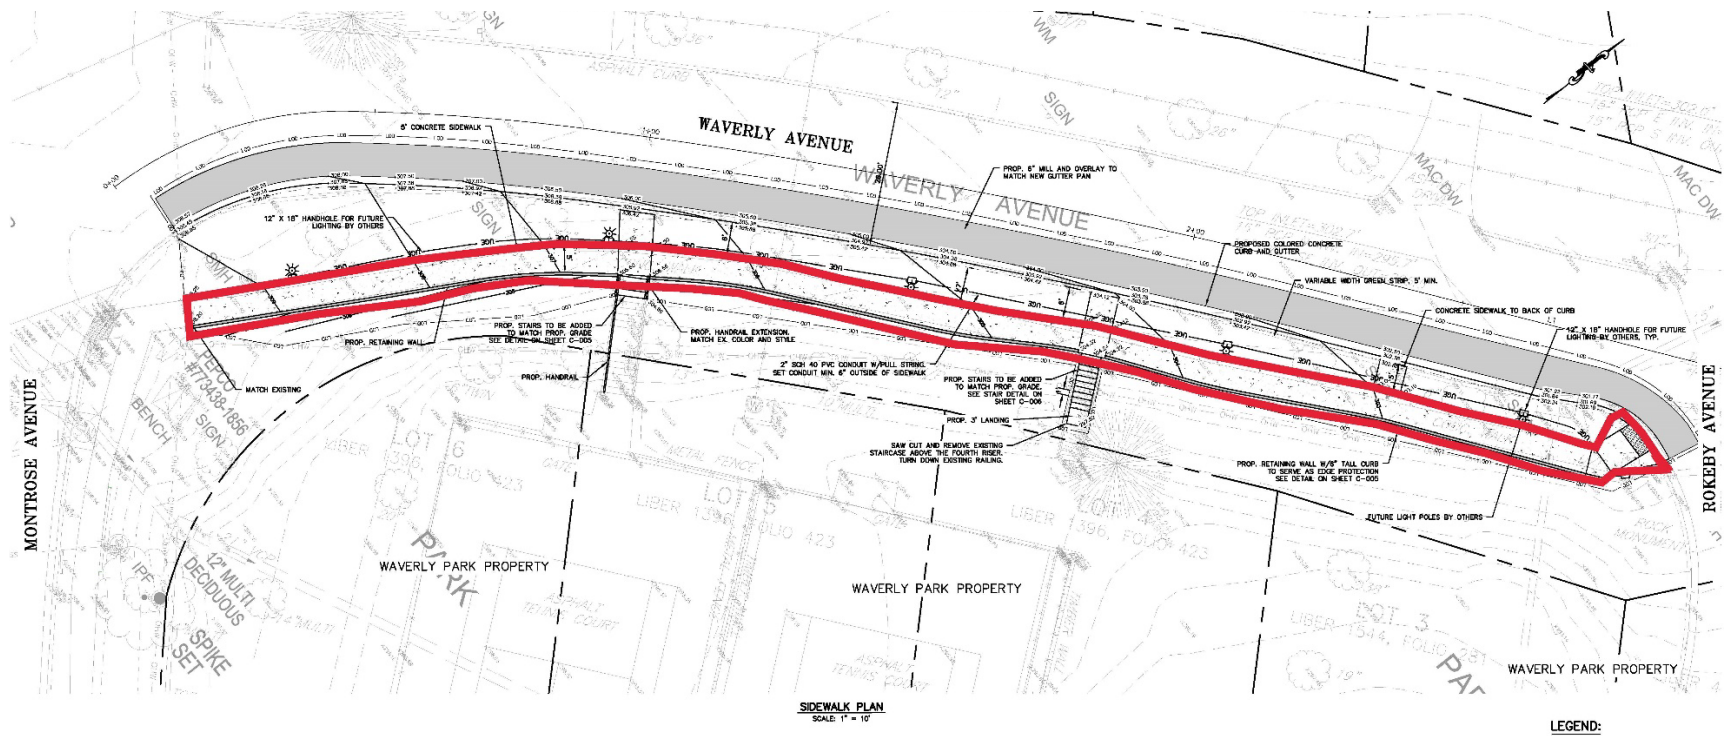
This site plan shows both the proposed sidewalk to be replaced and widened and new retaining wall curb outlined in red.
